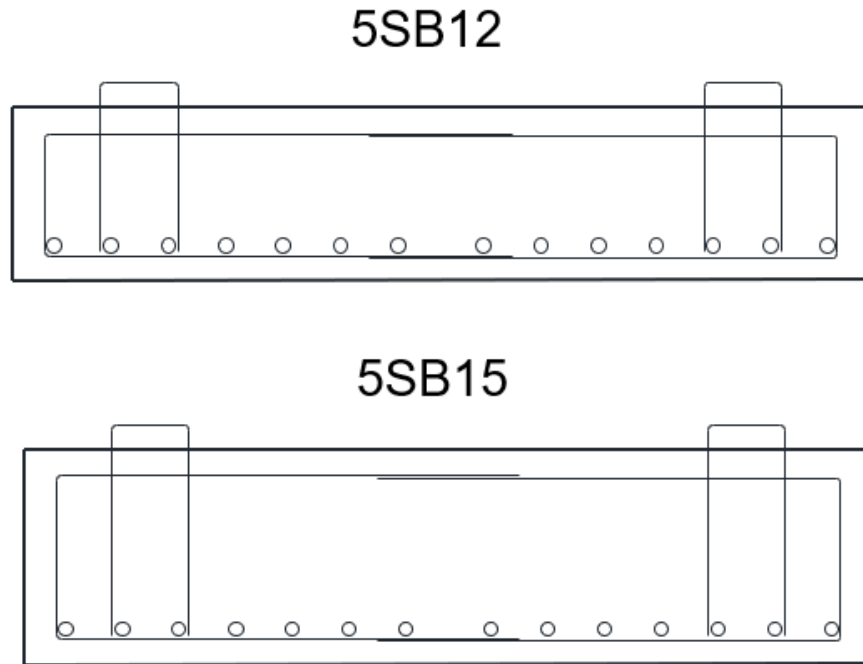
Reinforcement detail and strand layout for the specimens (5SB12 and 5SB15)
